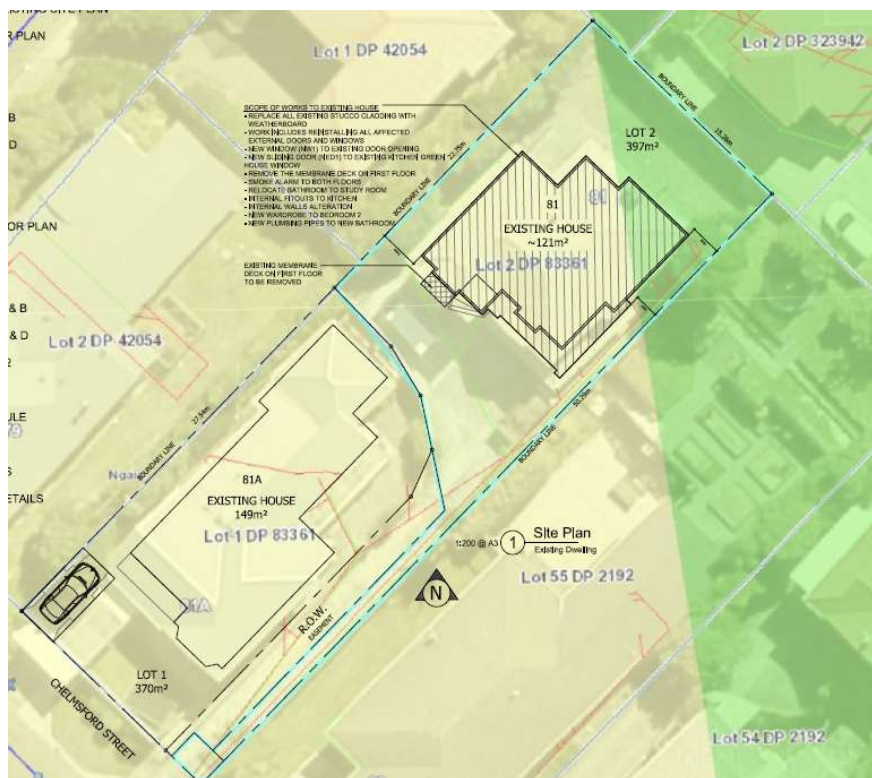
Site plan indicating 81 Chelmsford Street [not to scale]
